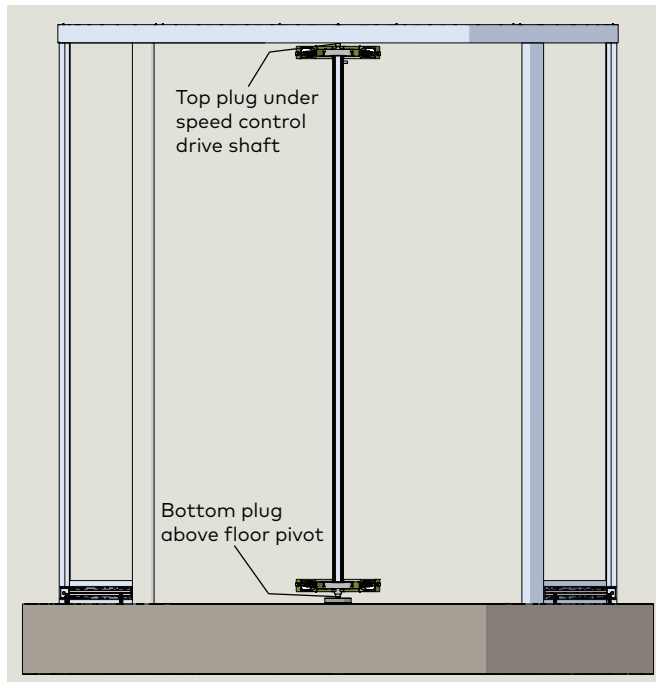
Center shaft bottom plug above floor pivot
